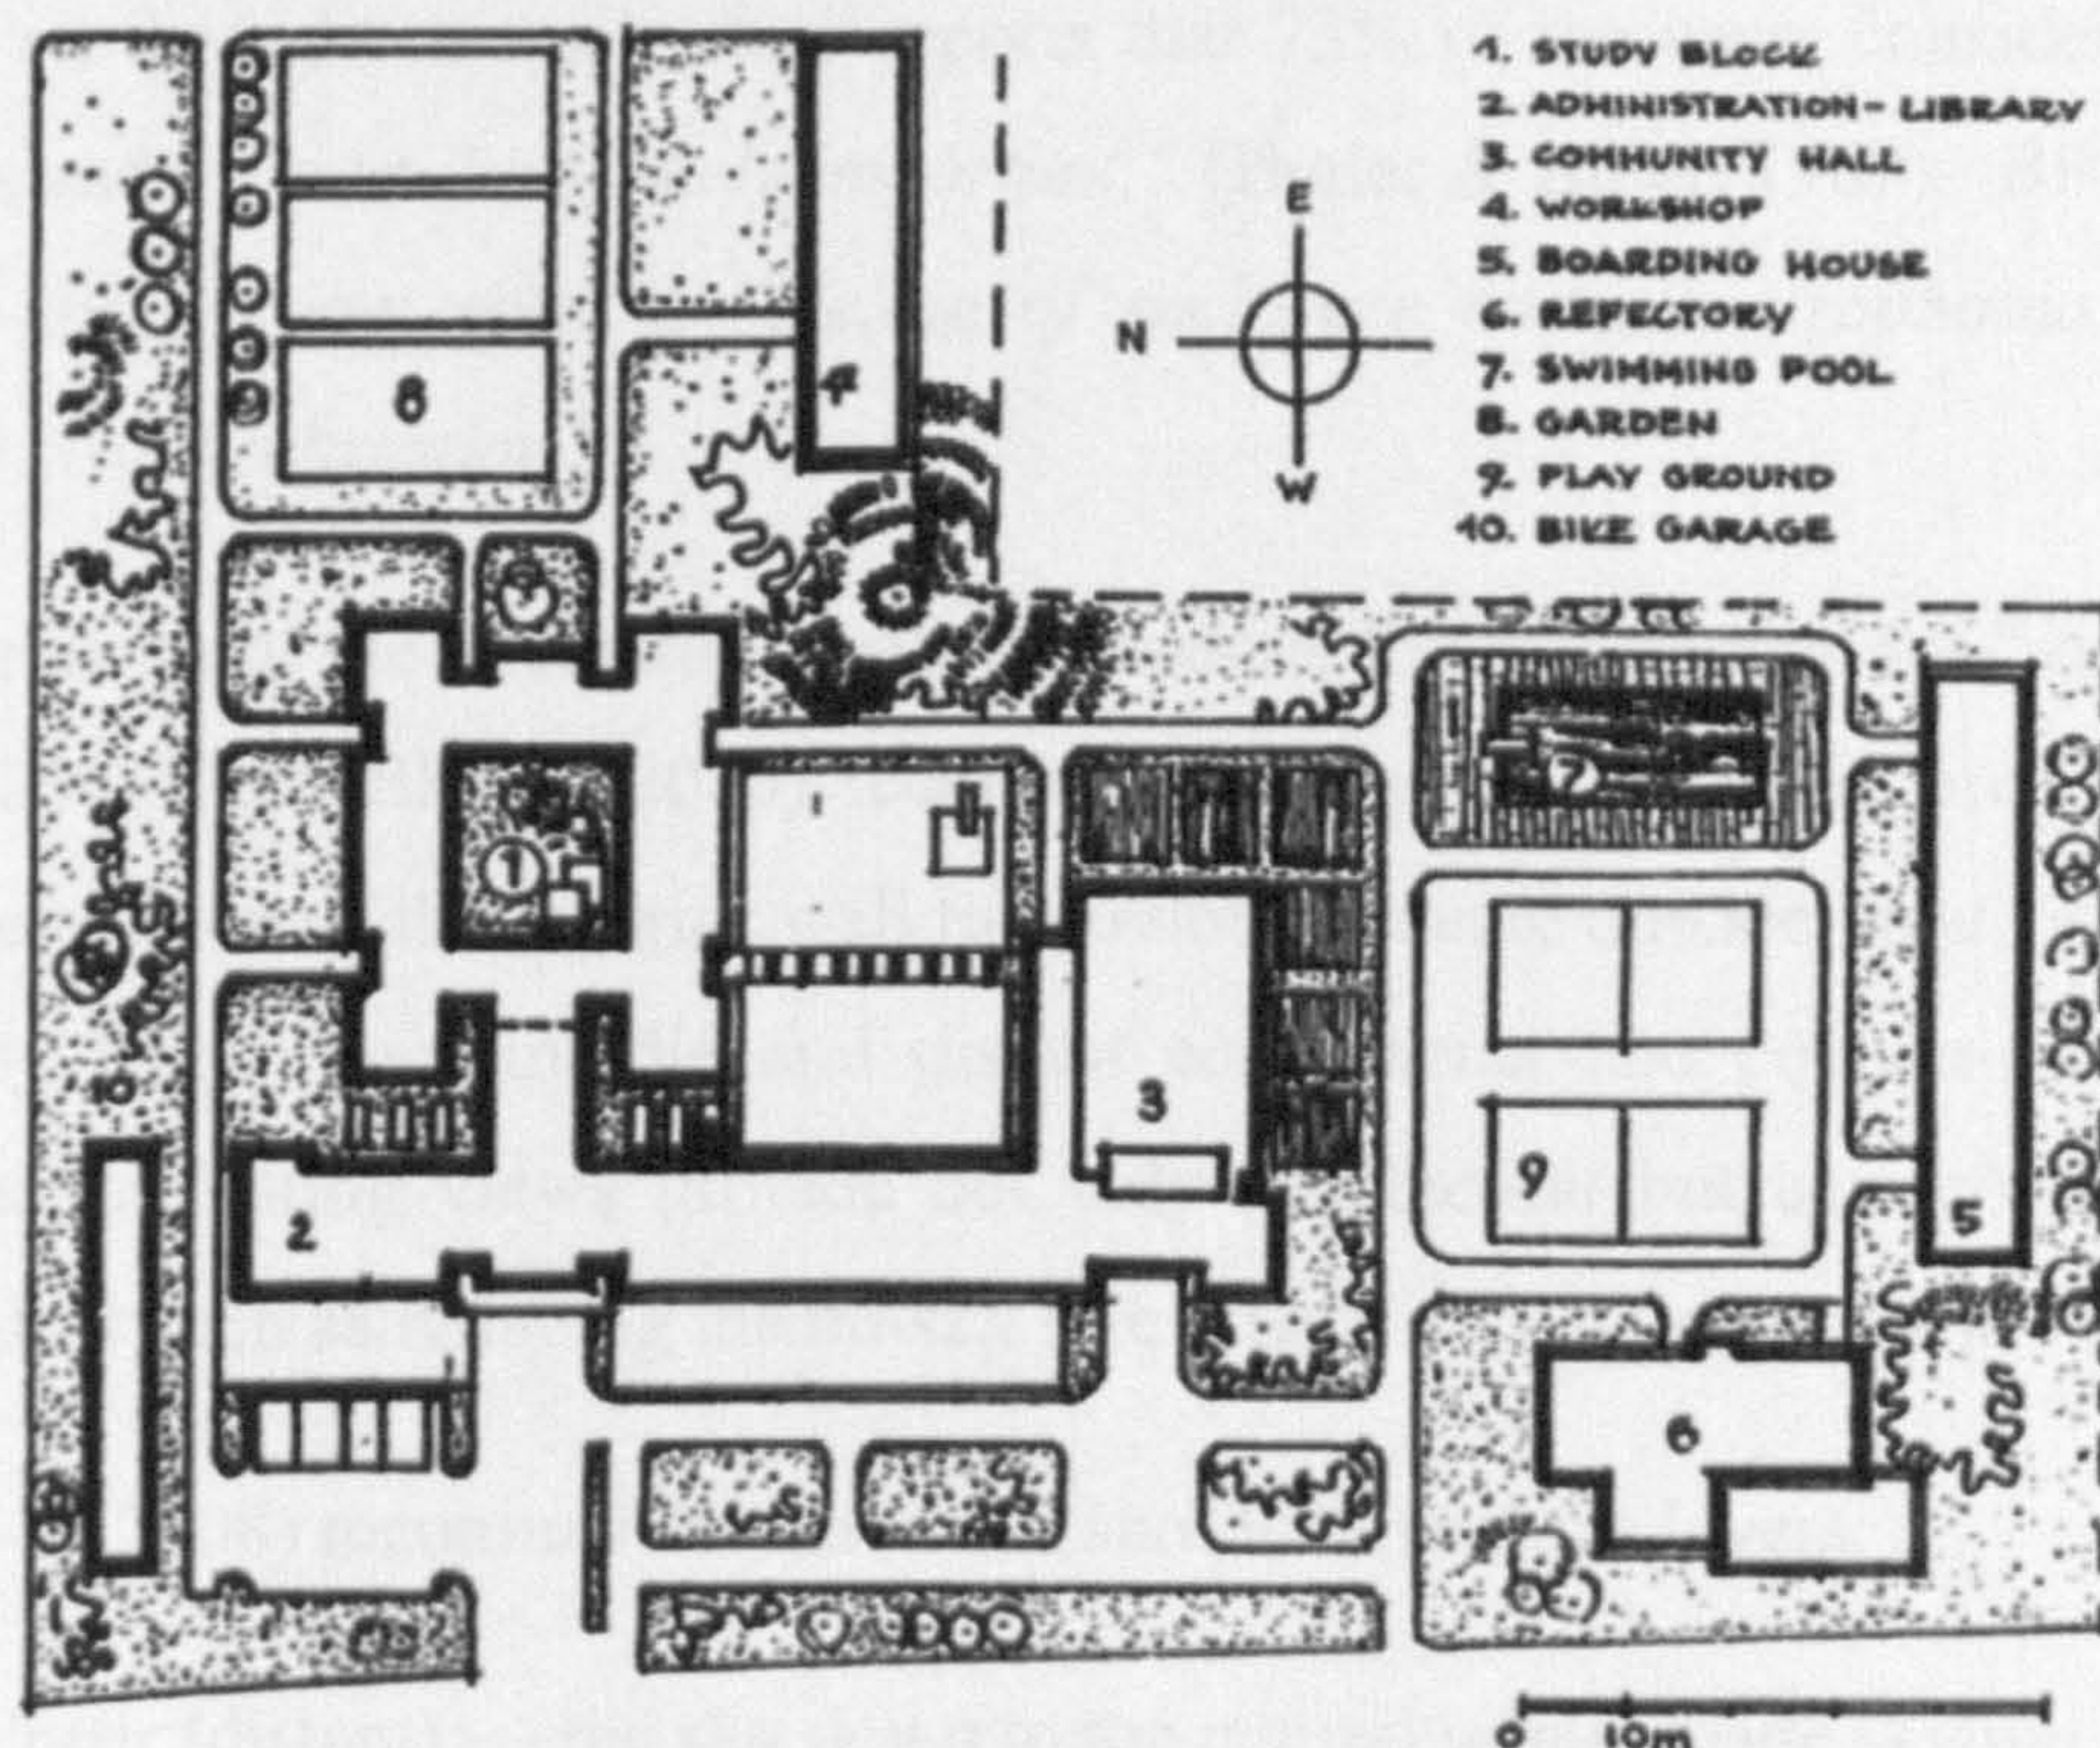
Typical standard school site layout in Vietnam. (UNICEF, 1982)
